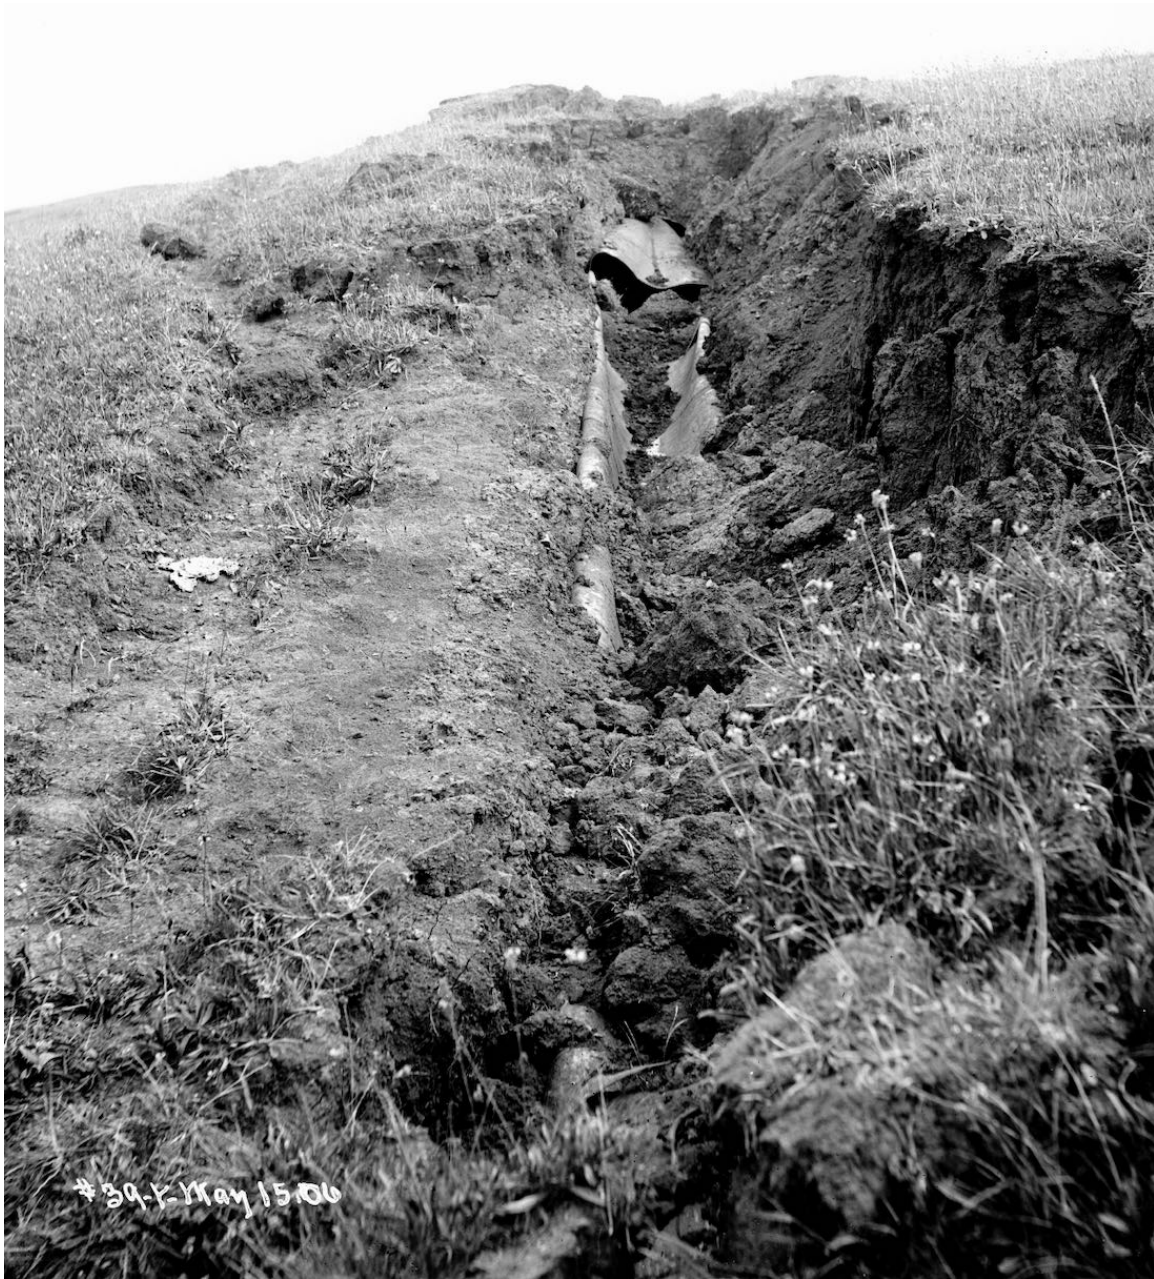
Failure of Pilarcitos 30 inch pipeline about 220 yards south of FX-1. Pipe is collapsed on itself. Looking southerly. (Photo: Schussler 1906, HS-4)
